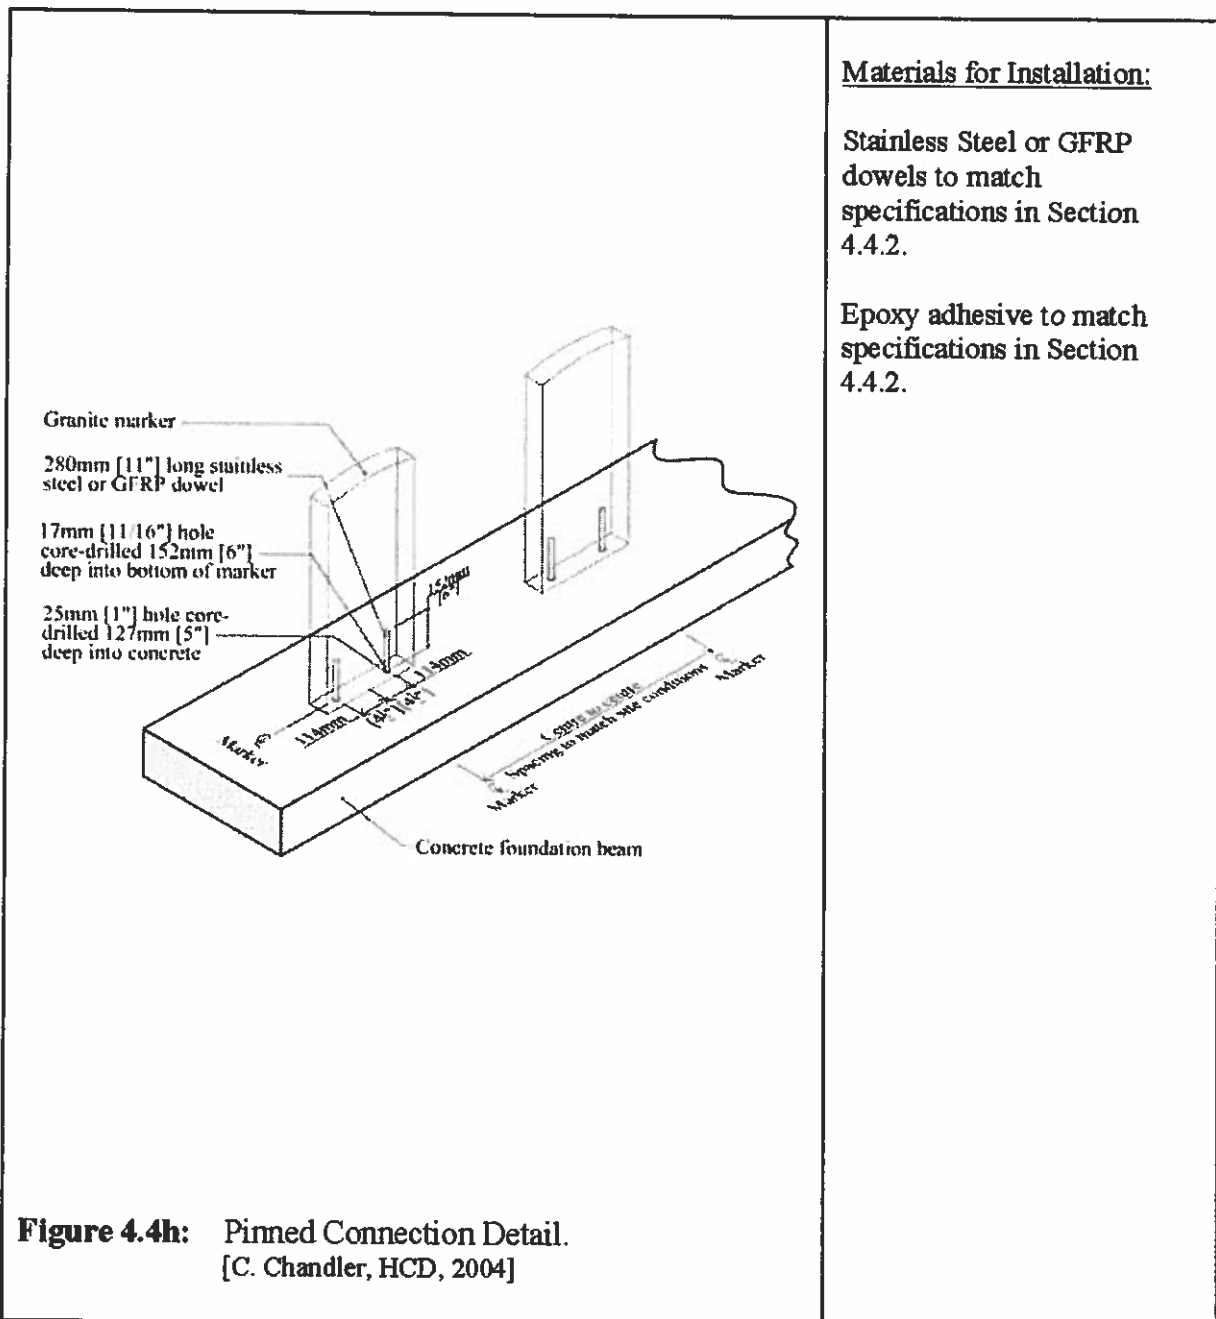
, below, illustrates the pinned connection detail for connecting an upright marker to its concrete foundation and the recommended installation process. The details and procedures are similar when using this connection detail for other markers types.
